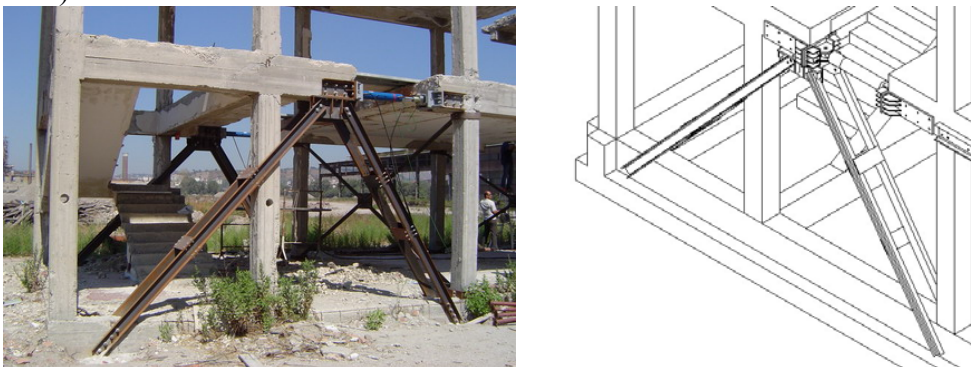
The reaction structural system (module n. 6 strengthened by steel V-bracings)
